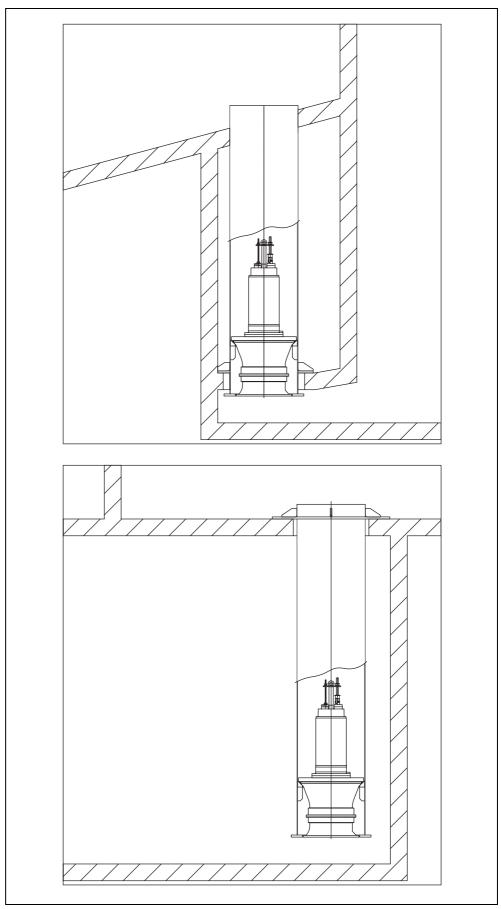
Installation in pipes in covered intake chambers and pipe overflow models
